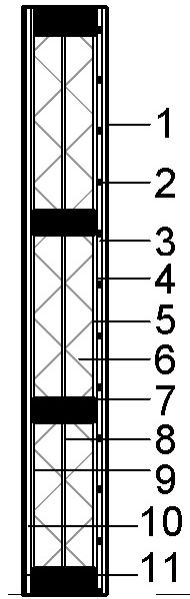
Autodesk Revit model of scenario D of basic wall detail
